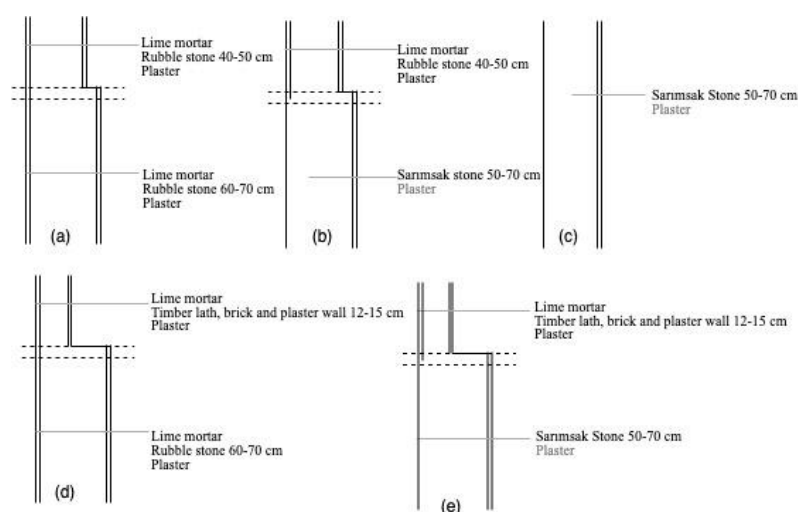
Layers of walls in traditional Ayvalık houses (Created by the author)
